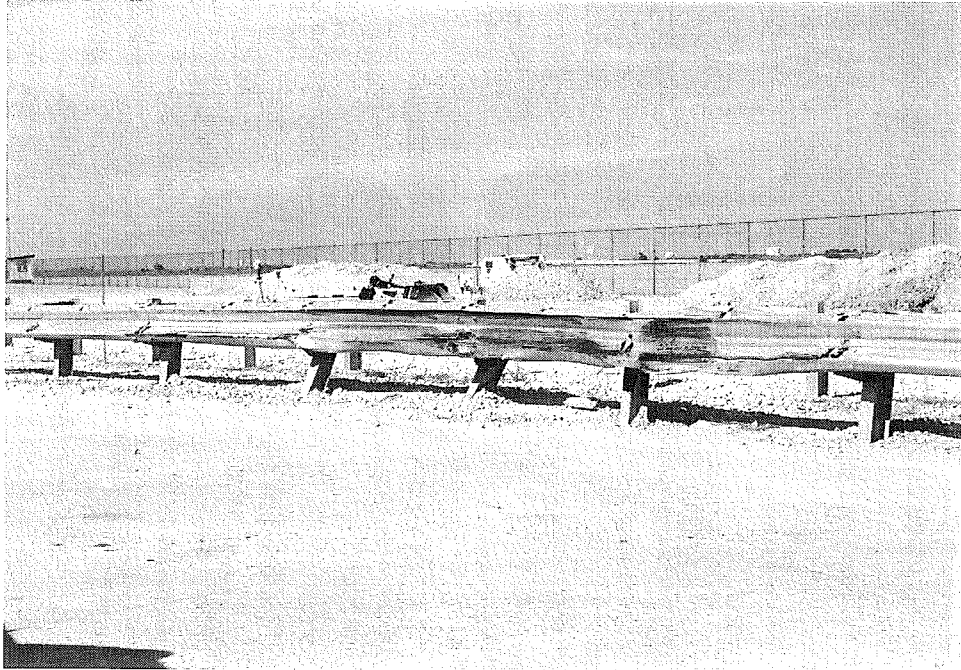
Type B Longitudinal Barrier Damage, Test MIW-1
